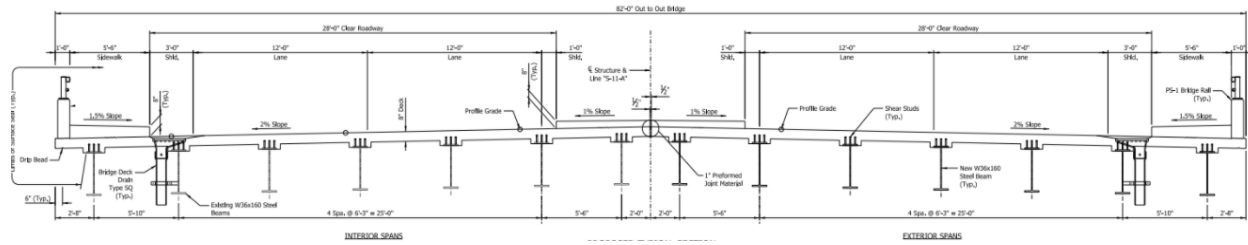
Typical Section of the Bridge (NBI 42020) (2016)
